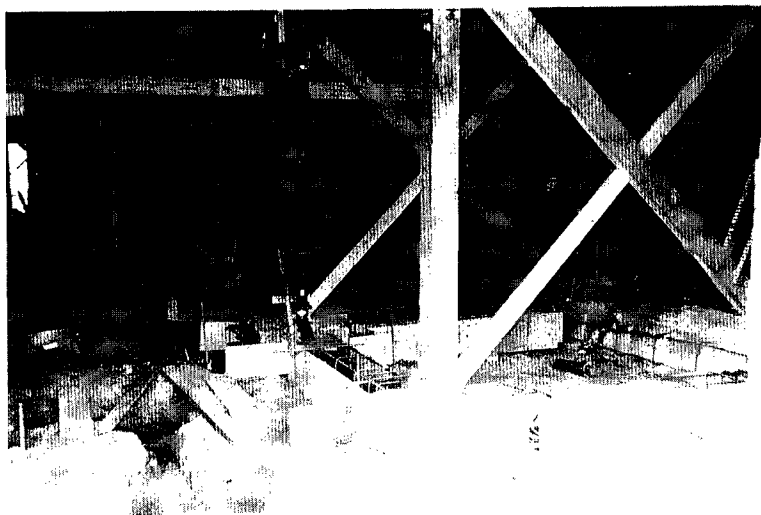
Typical repair method with foundation tie-beams and braced wood frames (photographed on 5/13/90).
